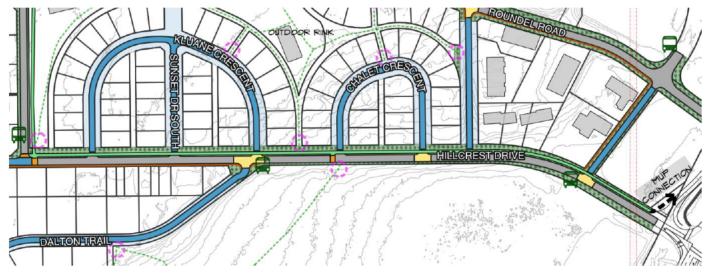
CLOSE UP OF CONCEPT PLAN
